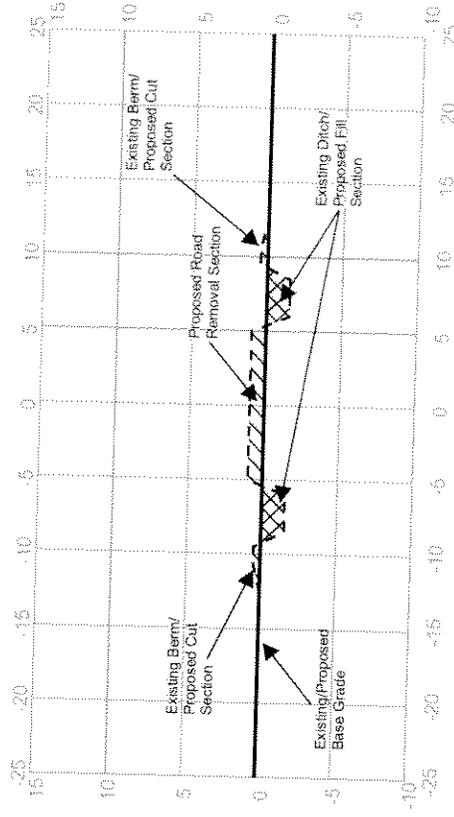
DITCH BLOCK WITH CONTROL ELEVATION (TYPICAL SECTION)
